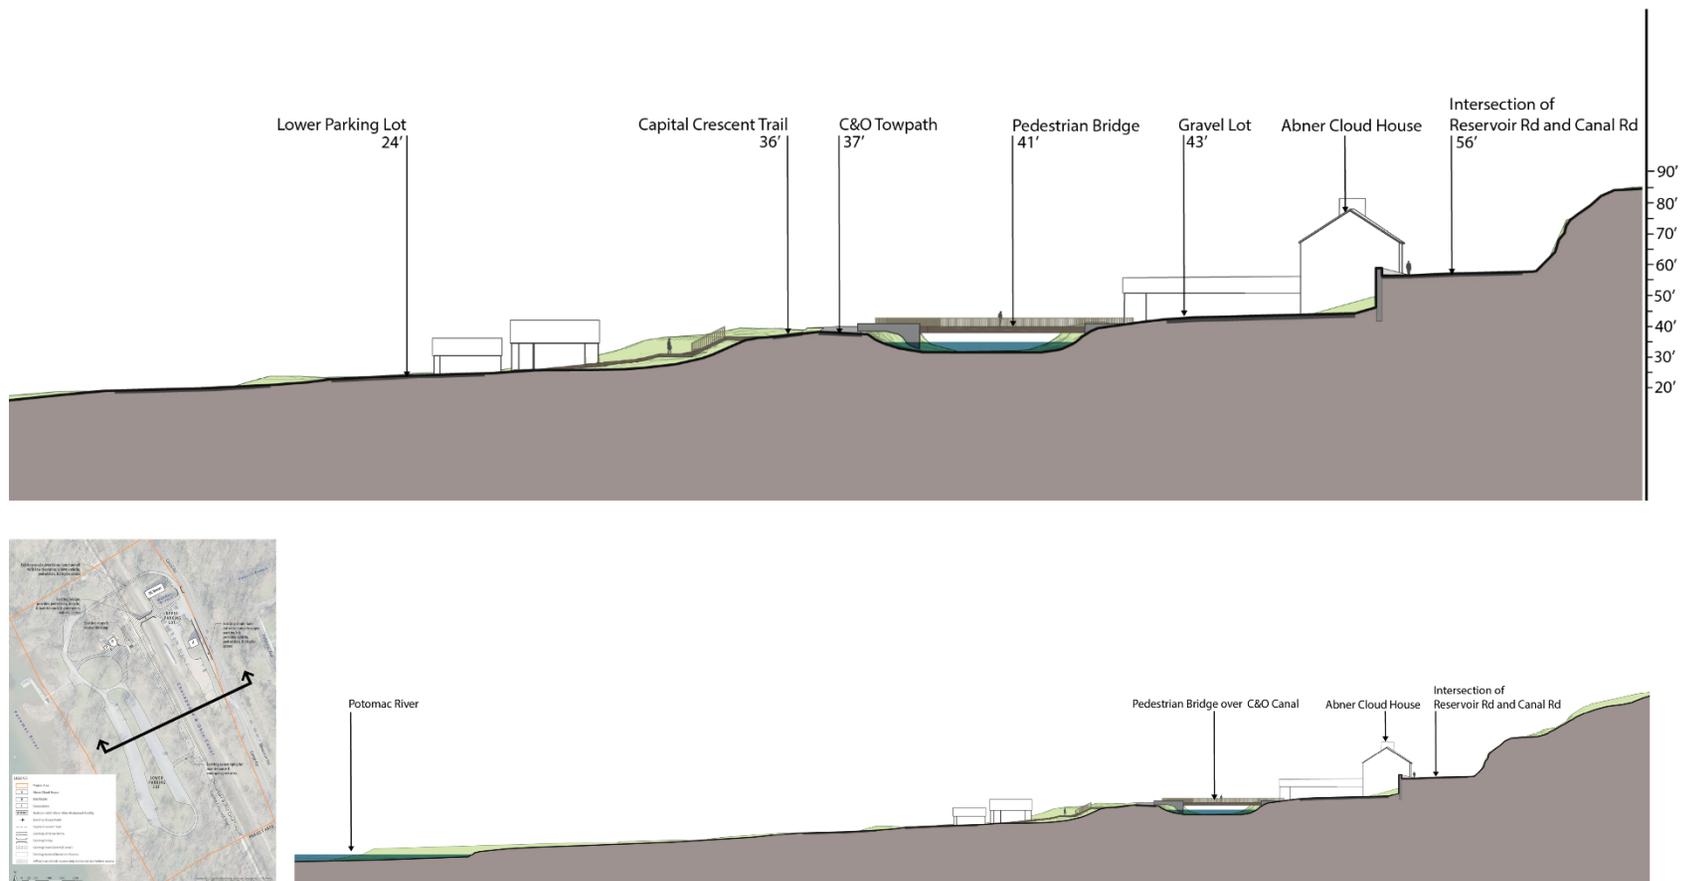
Section and Elevation of Existing Conditions (detailed and full section of site)
